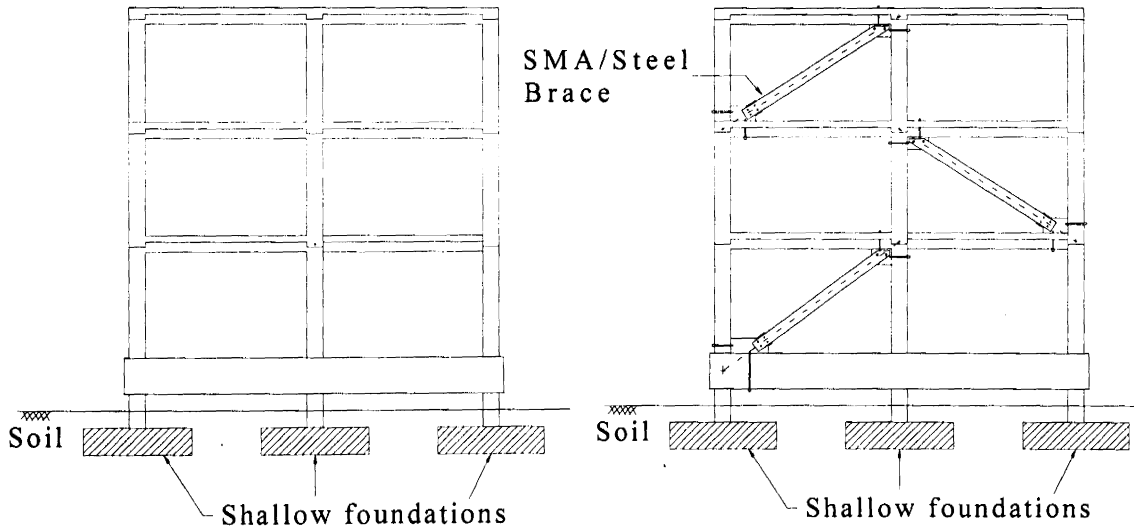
Bare frame structure with shallow foundations and Foundation- Structure system with energy dissipating braces
